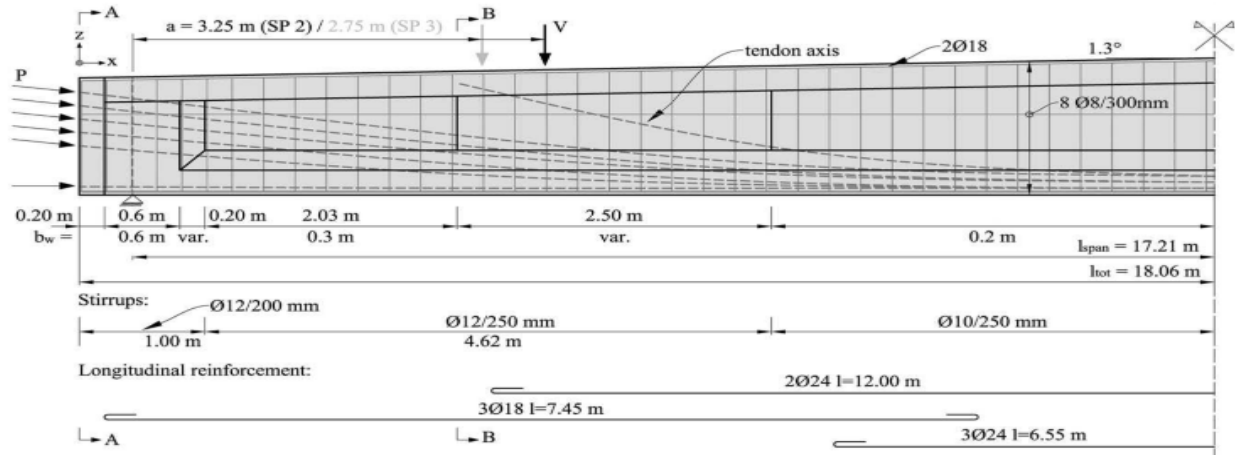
Longitudinal view of test-setup for Sudtirolerplatz bridge girder [1].
